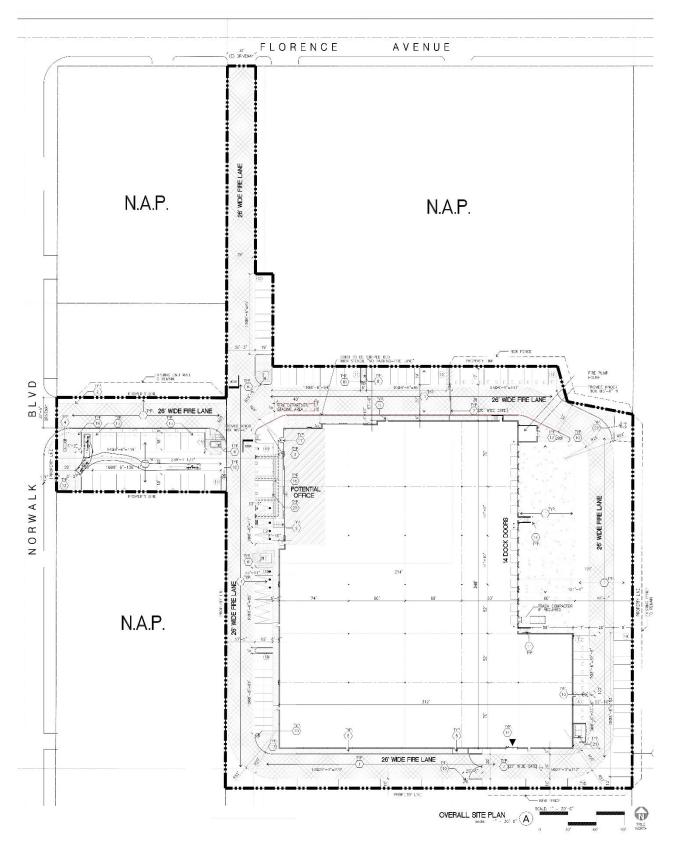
SITE PLAN SOURCE: HPA ARCHITECTURE
